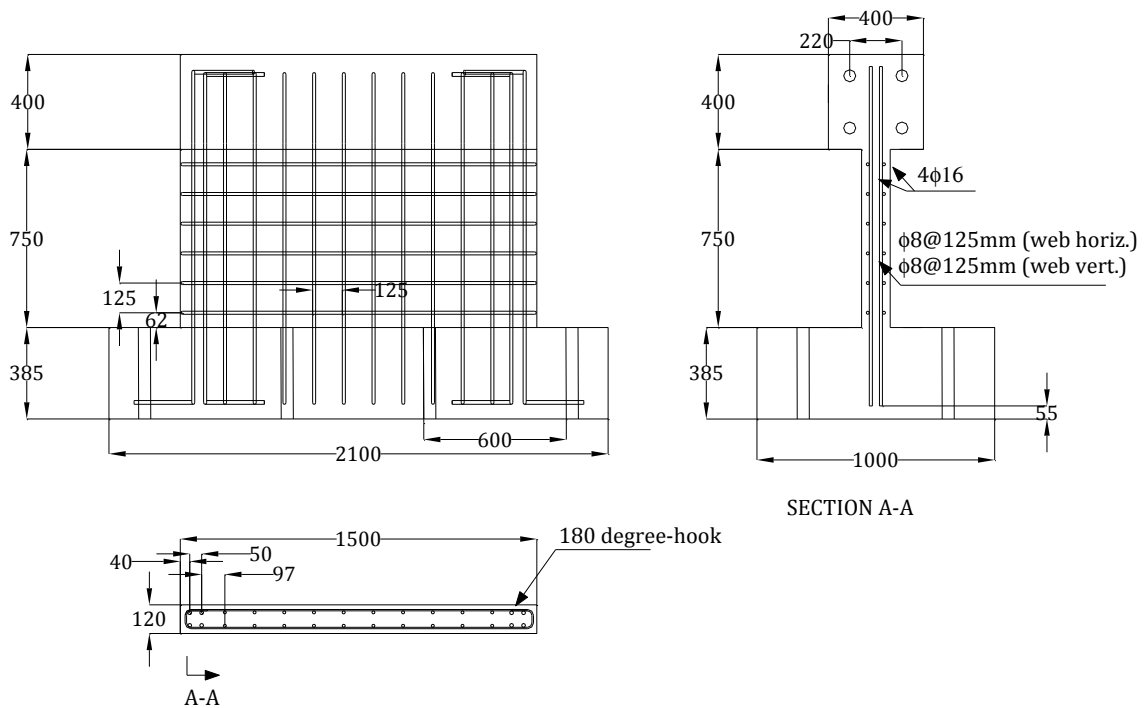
Geometry and wall reinforcement of specimen T2-S2.
